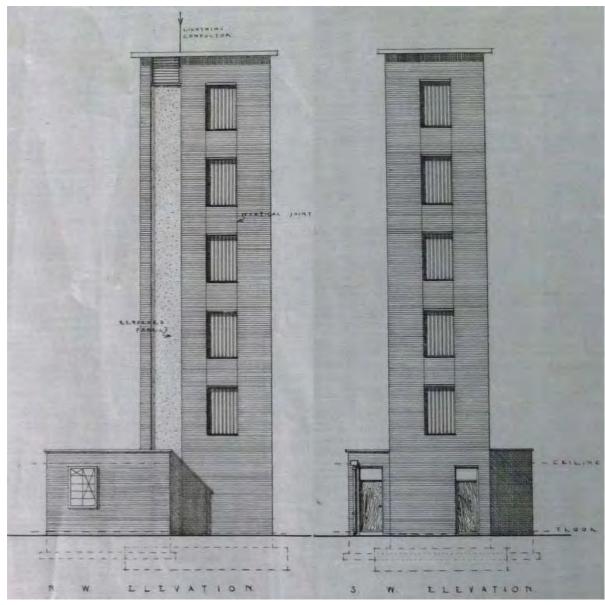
Fire Brigade Headquarters Building, front and rear elevations, 1957
